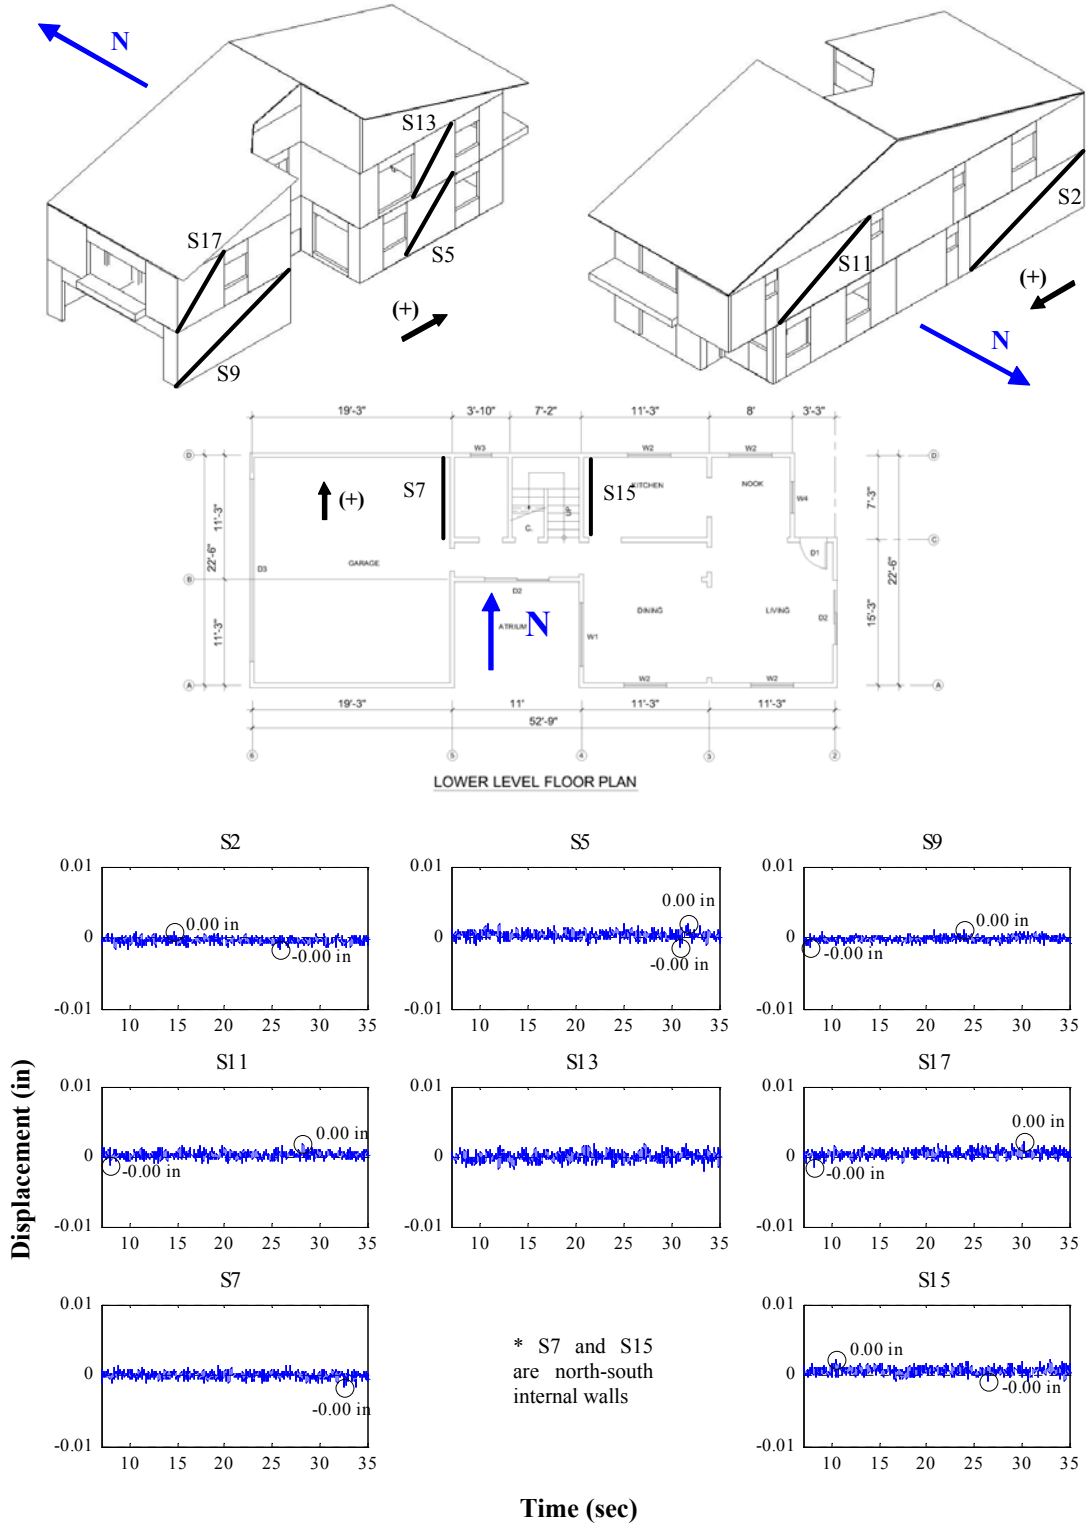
Wall deformations of east-west internal walls for Test NWP2S07
